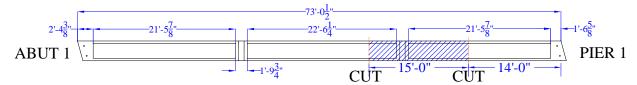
Plan View of Span 1 Beam 3 of Clearfield Creek Bridge
